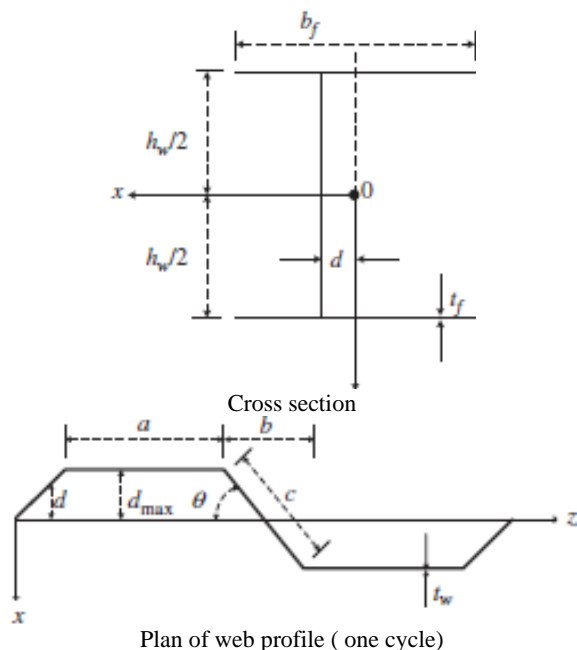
Cross section and Plan of web profile (one cycle) of corrugated web plate girder.
